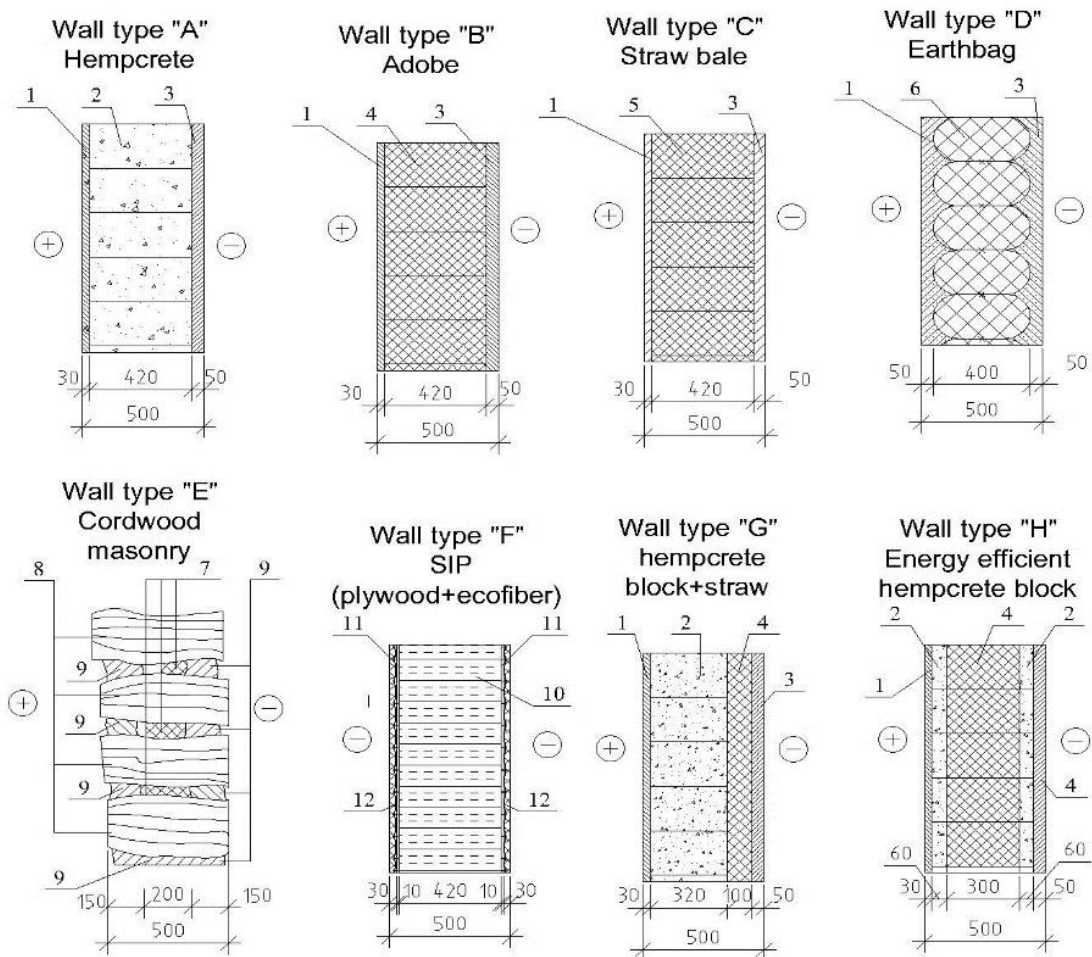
Cross sectional scheme of considered wall types (1 – internal lime-sand plaster, 2 – hempcrete, 3 – external lime-sand plaster, 4 – adobe, 5 – strawbale panel, 6 – earthbag, 7 – chopped straw as insulator, 8 – cordwood, 9 – lime-sand plaster, 10 – ecofiber, 11 – lime-sand plaster, 12 – plywood)
